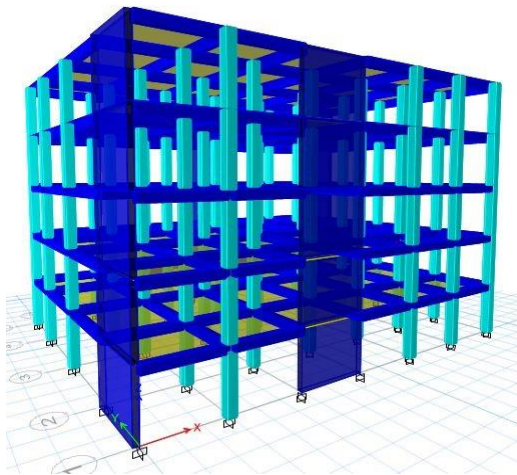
Five story building model with 0.5% shear wall ratio in each direction
